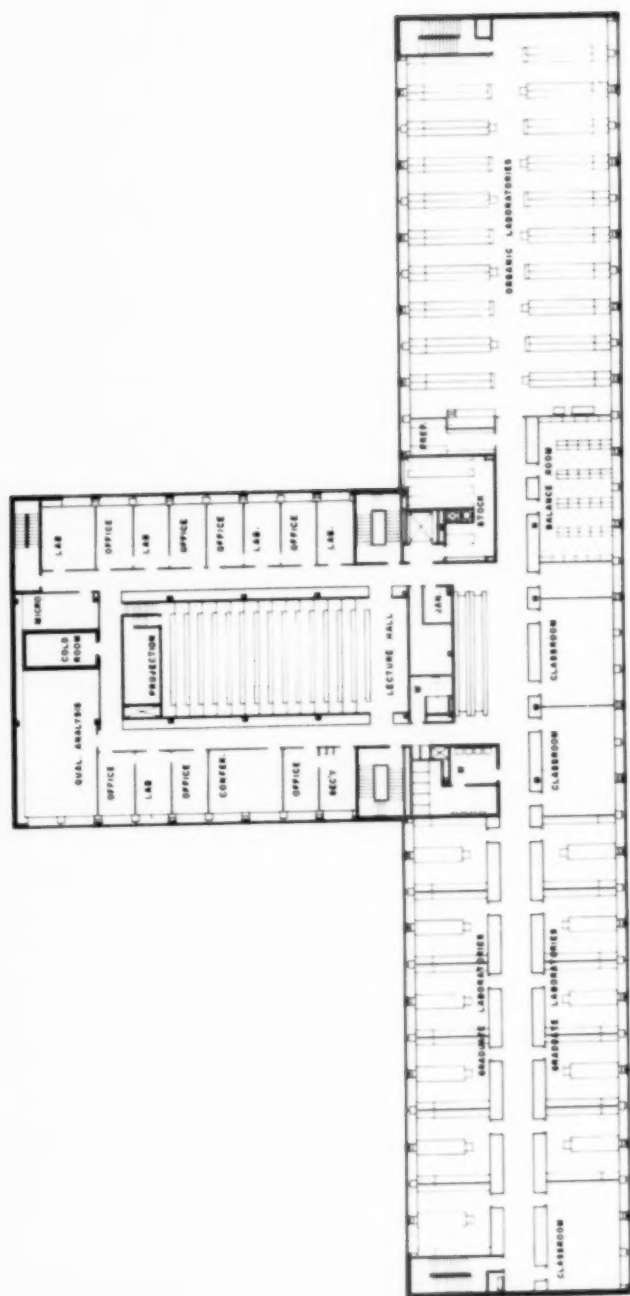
FIFTH FLOOR PLAN, UNIVERSITY OF ILLINOIS
